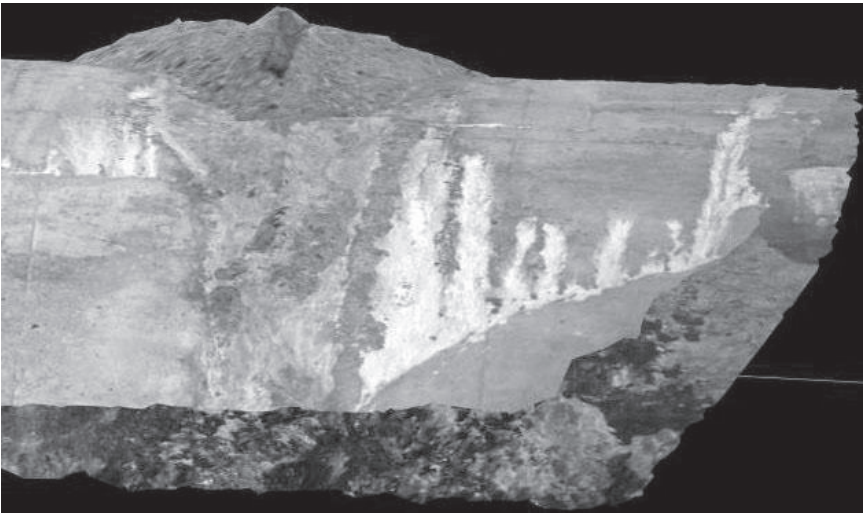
3D view of the photo texture on the DTM for an image pair showing significant tunnel lining damage (above)
